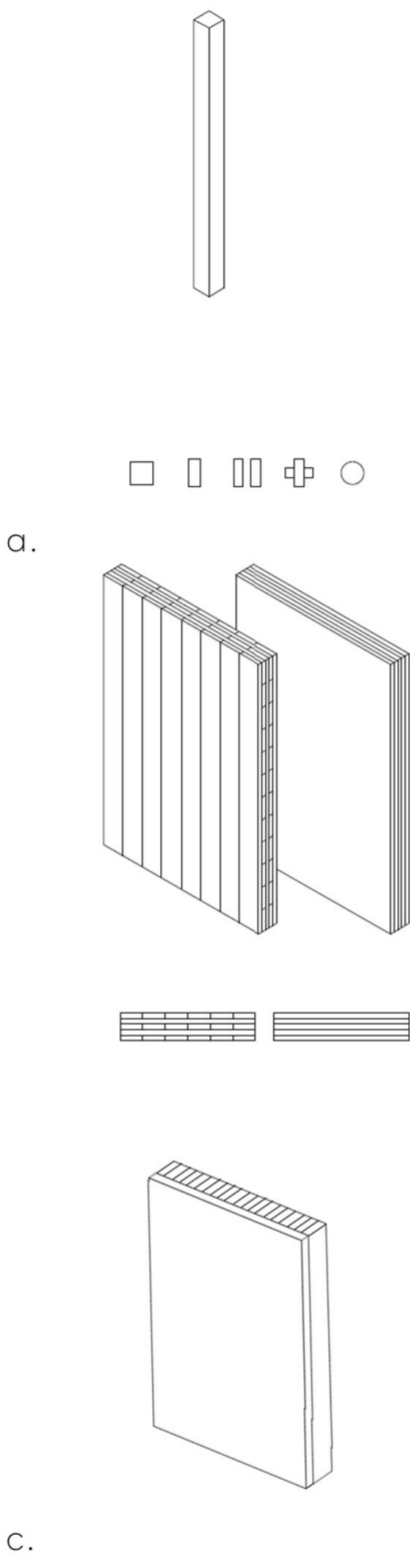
Examples of vertical structural components. a. Glulam & timber columns, b. CLT and DLT walls, c. LVL walls
